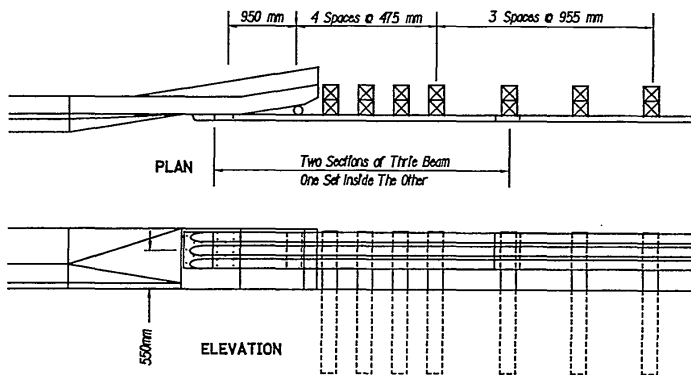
Flared Concrete Bridge Railing with Thrie-Beam Approach Rails and Reduced Post Spacing
